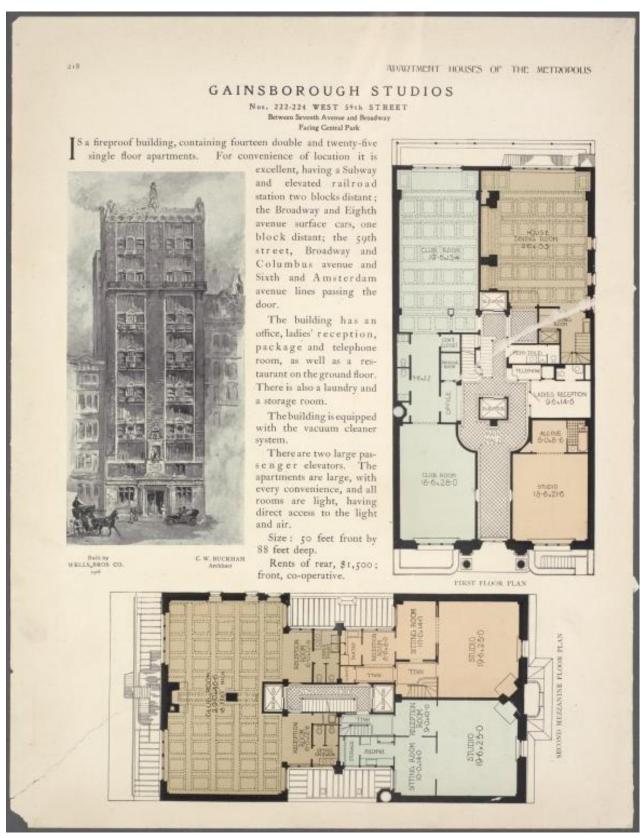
Gainsborough Studios Floor Plan, from "Apartment Houses of the Metropolis," 1908.
